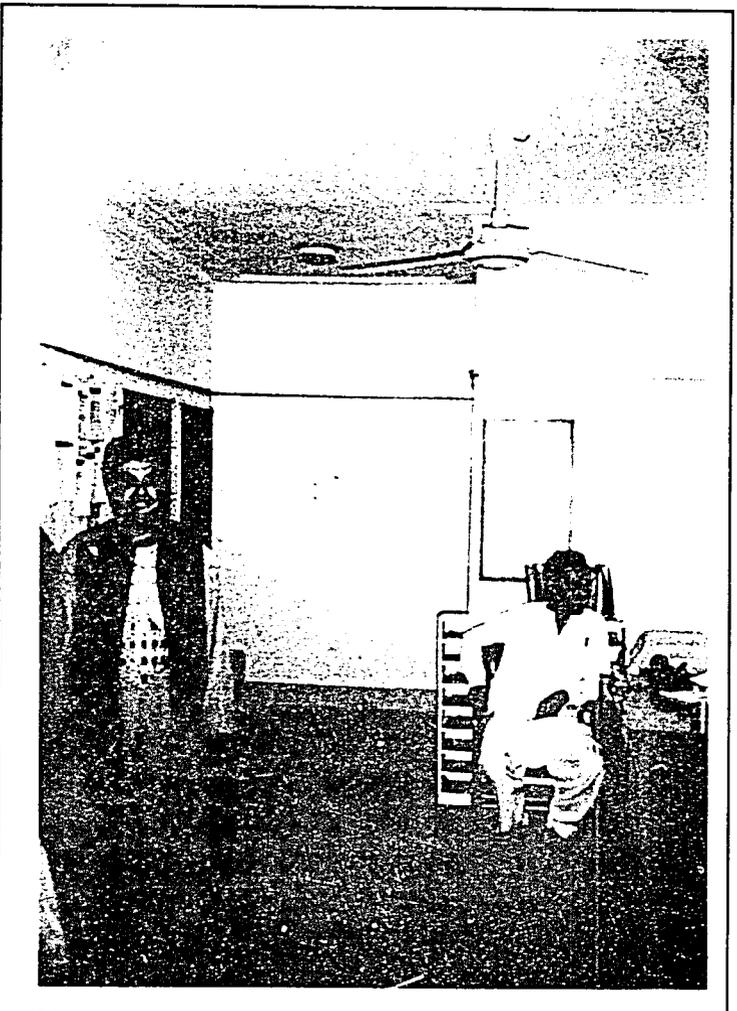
Quetta AID/REP Office Facility. Hallway outside AID/Rep's office. Cable to follow existing conduit path on left side of hallway.
